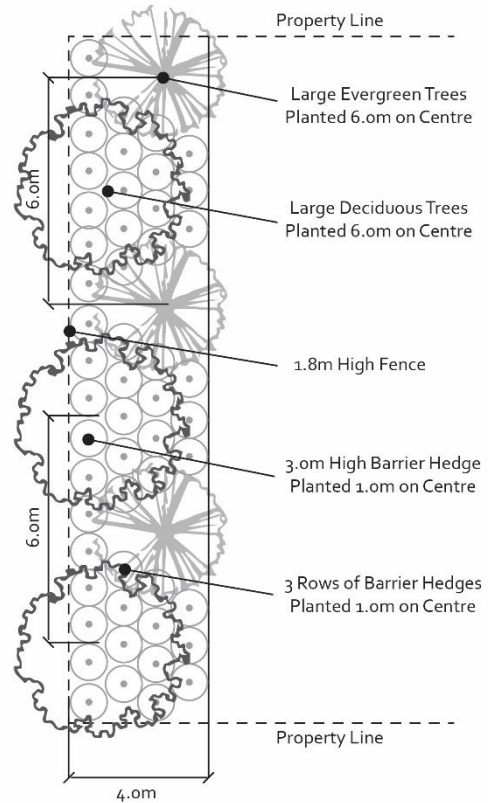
Example of vegetated buffer landscape plan for 4 m width, adjust plantings to accommodate 6 m or 8 m vegetated buffer width.
